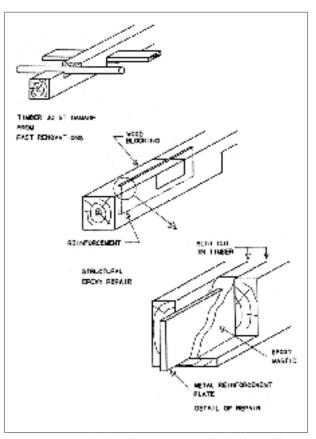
When repairing timbers damaged from previous renovation, fiberglass rods or metal plates can be used as reinforcement.
